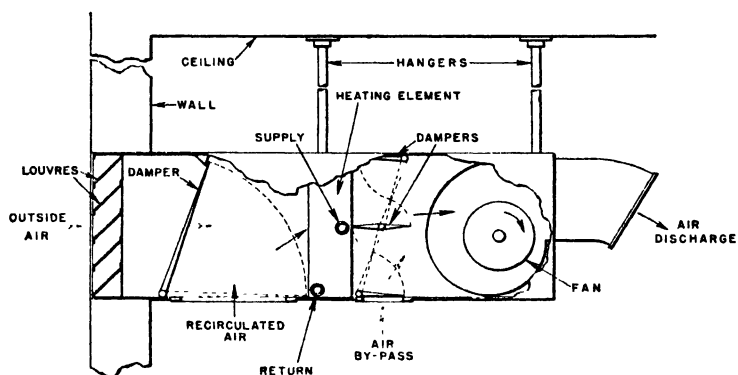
SUSPENDED TYPE UNIT HEATER, HOUSED TYPE FAN
